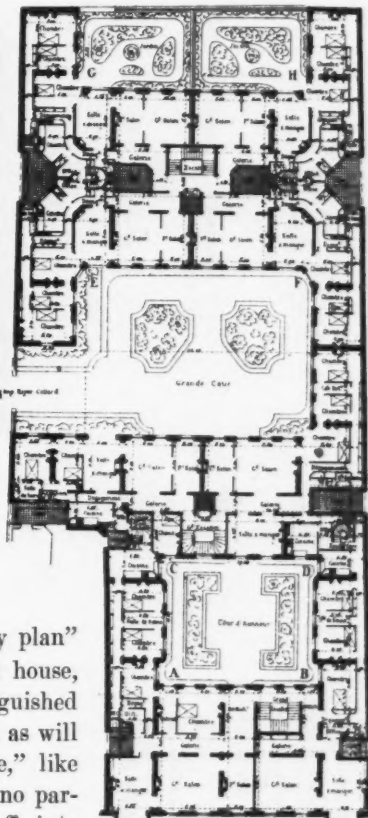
PLAN OF LARGE APARTMENT HOUSE, BY M. NERROT.
